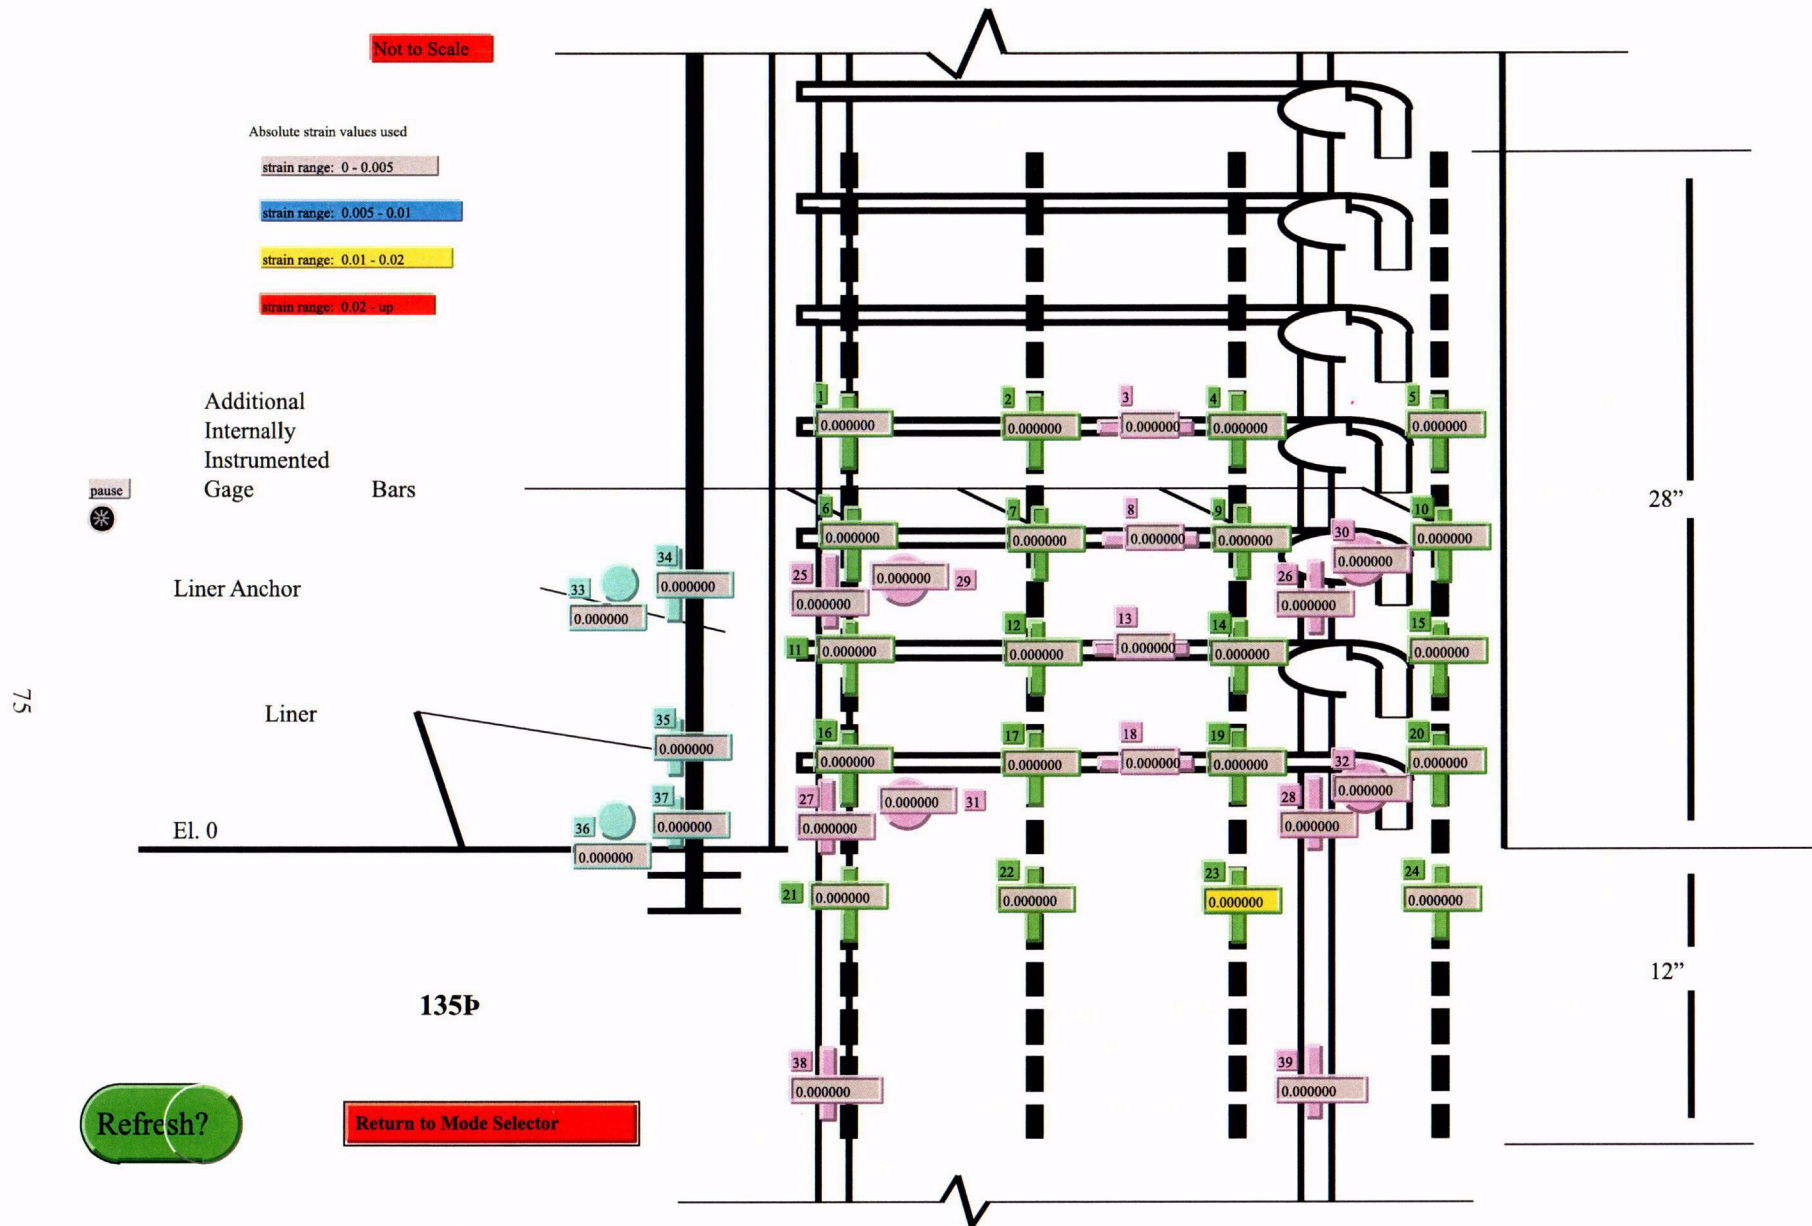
Basemat Junction, Gage Bar and Stirrup Strain Gage Locations
